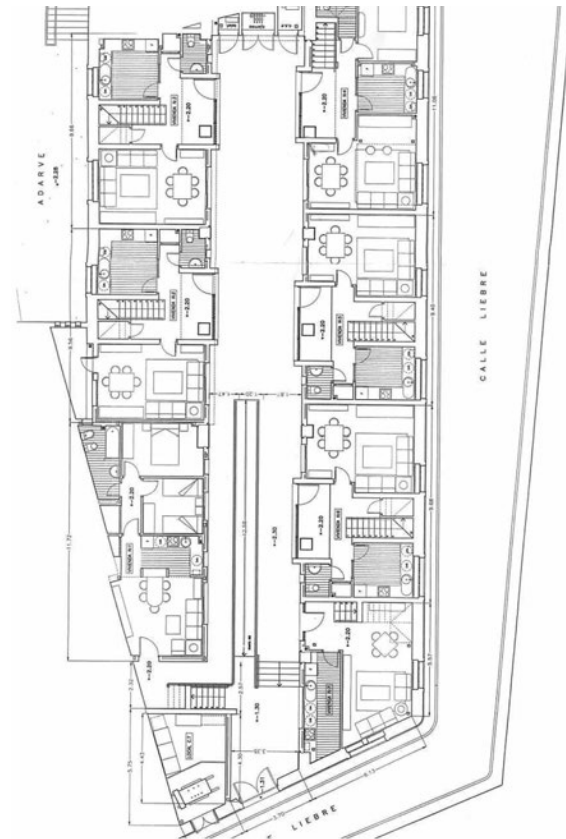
Floor plan of the bodega on 11, Liebre st after its transformation (Sánchez, 2014, 29).
